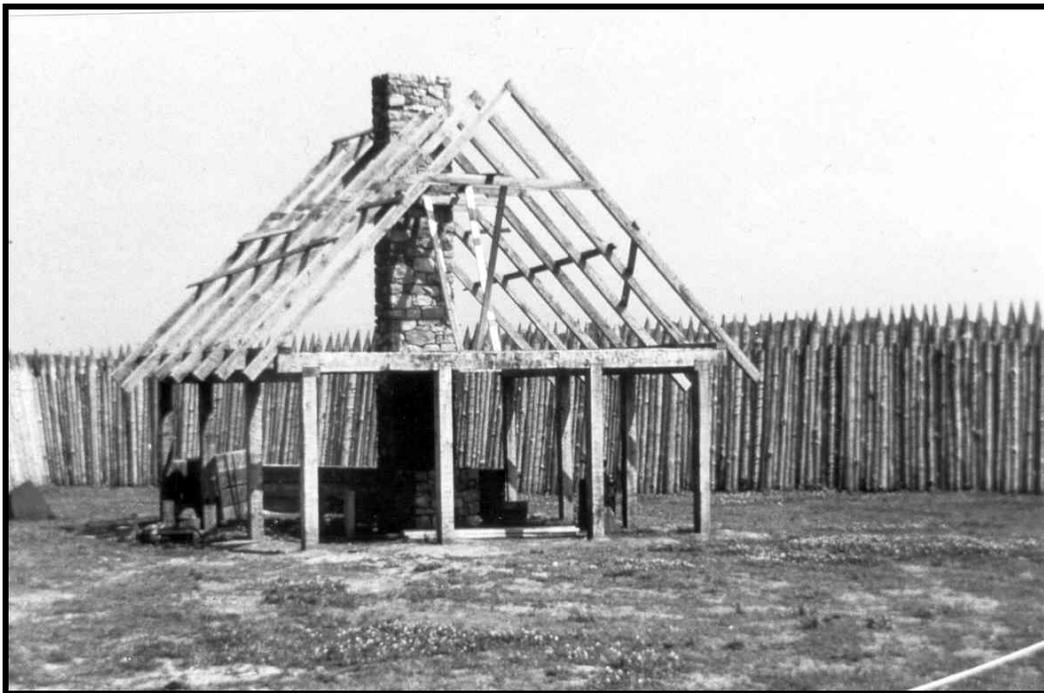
Blacksmith Shop Under Construction. This view shows the completed chimney and timber framing for the structure.
